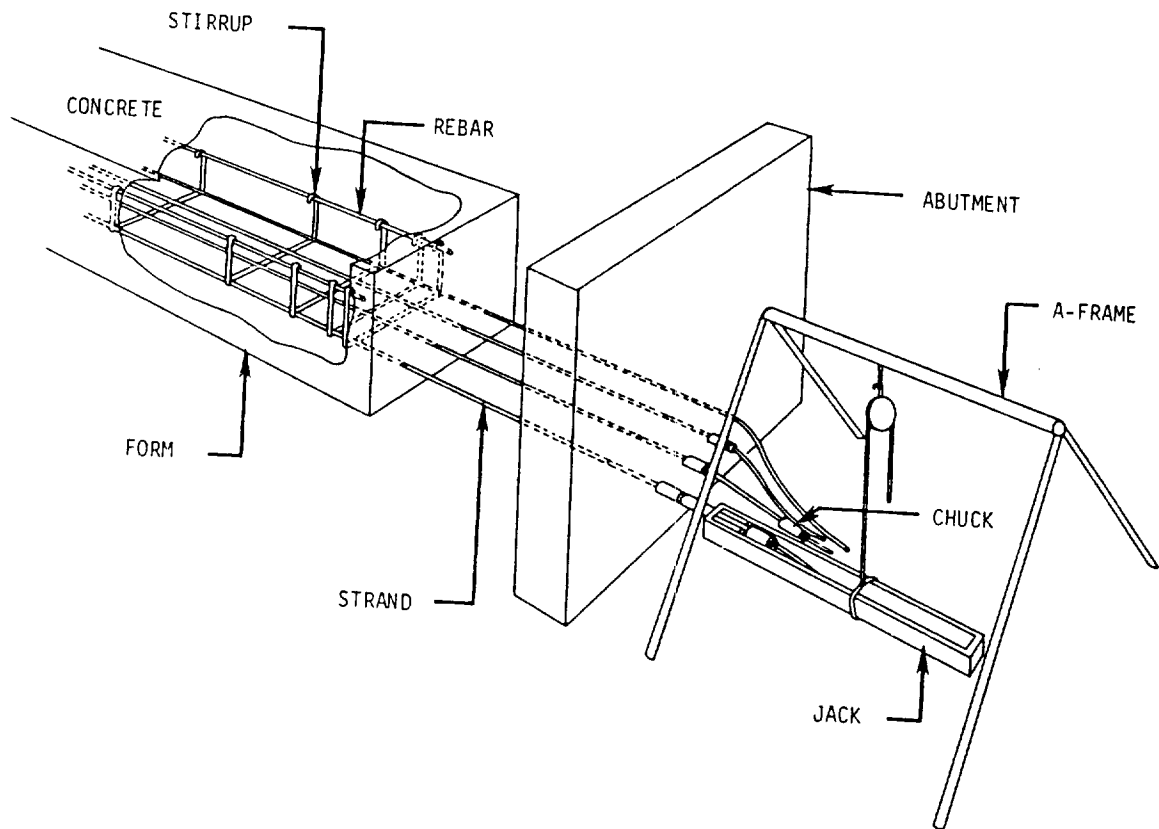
PRESTRESSED AND REINFORCED BEAM FORM
